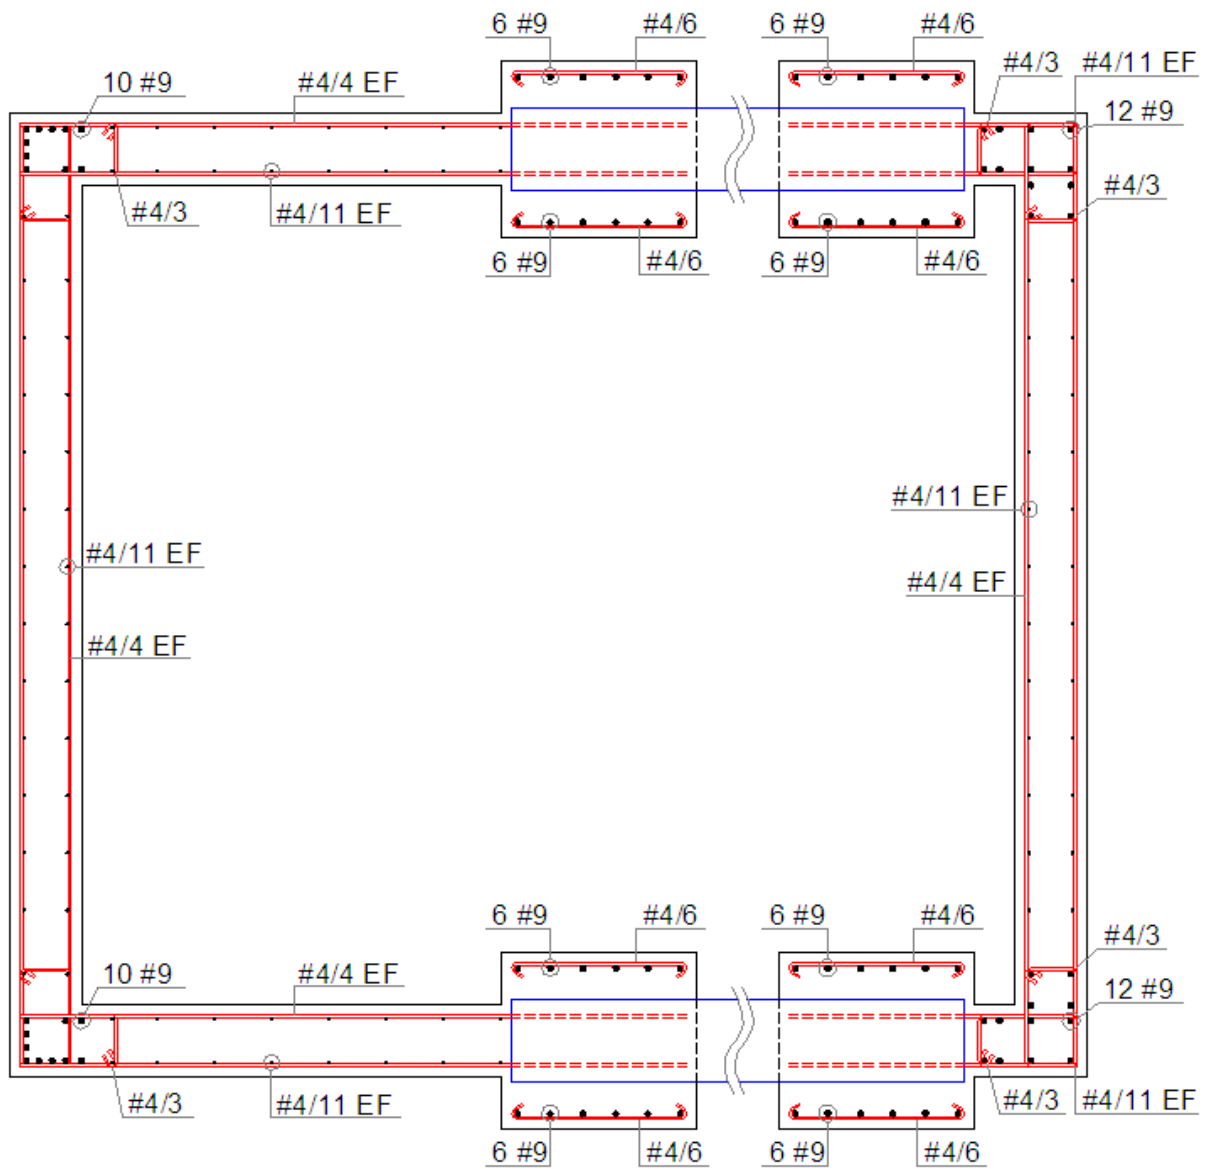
Section 1 reinforcement detail of CCW (stories 1-2)
